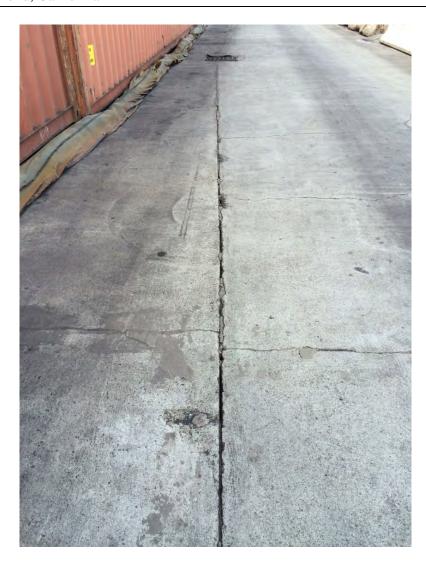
Looking south toward drain inlet 3DI-11A: areas of surficial cracking and concrete seam.
